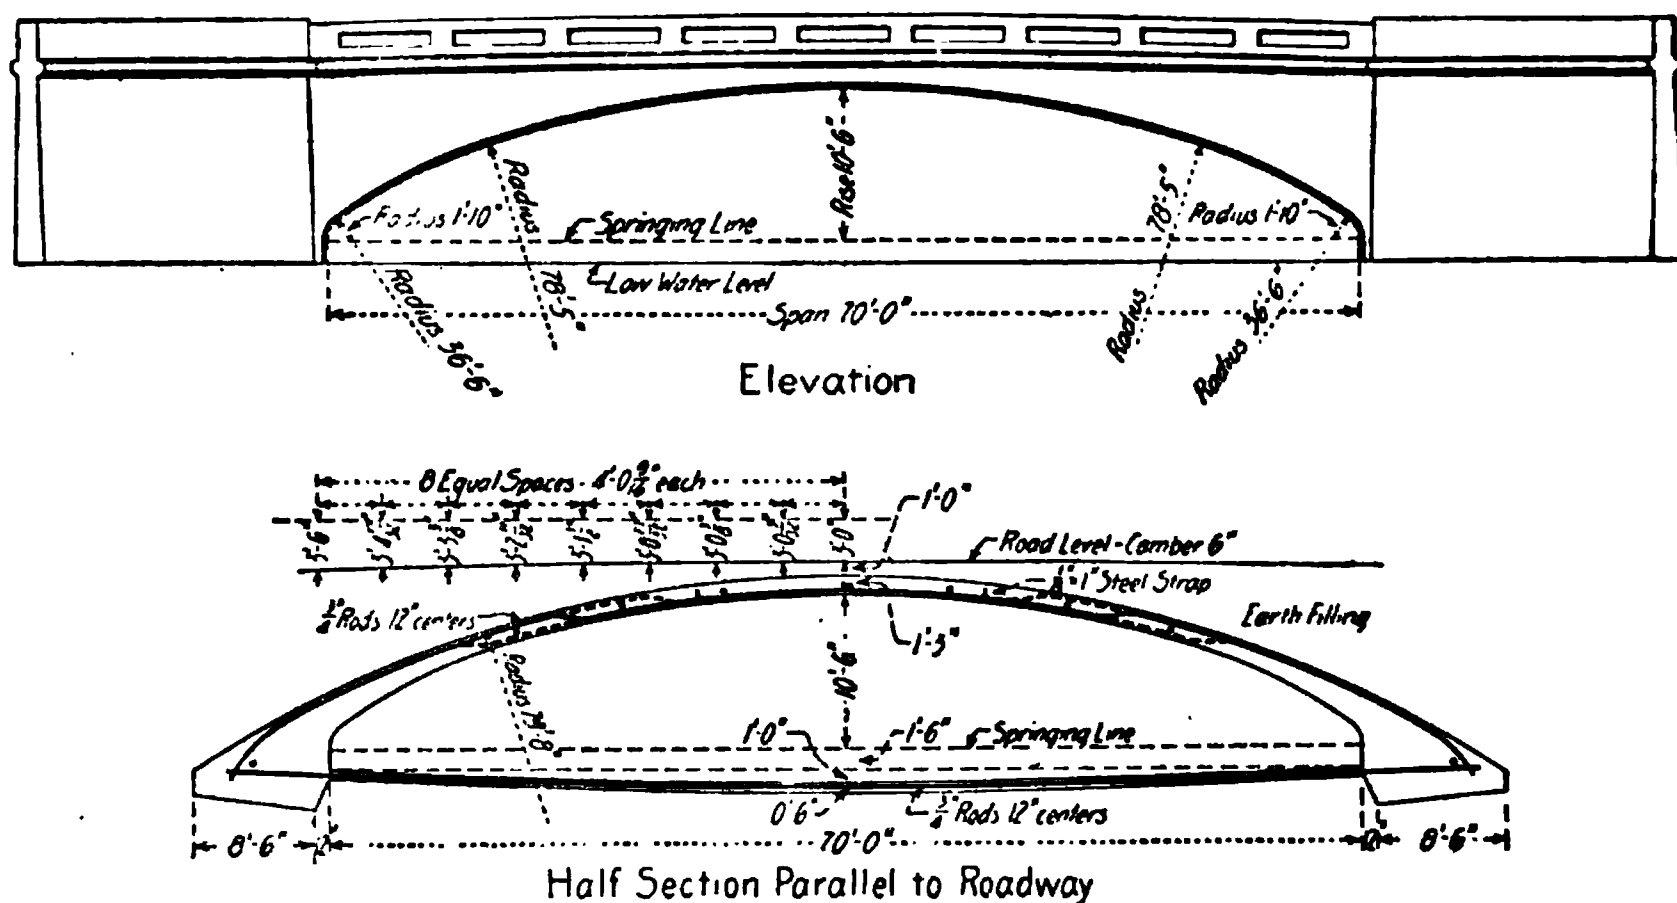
ELEVATION OF SEVENTEENTH STREET BRIDGE, BOULDER, COLORADO.
